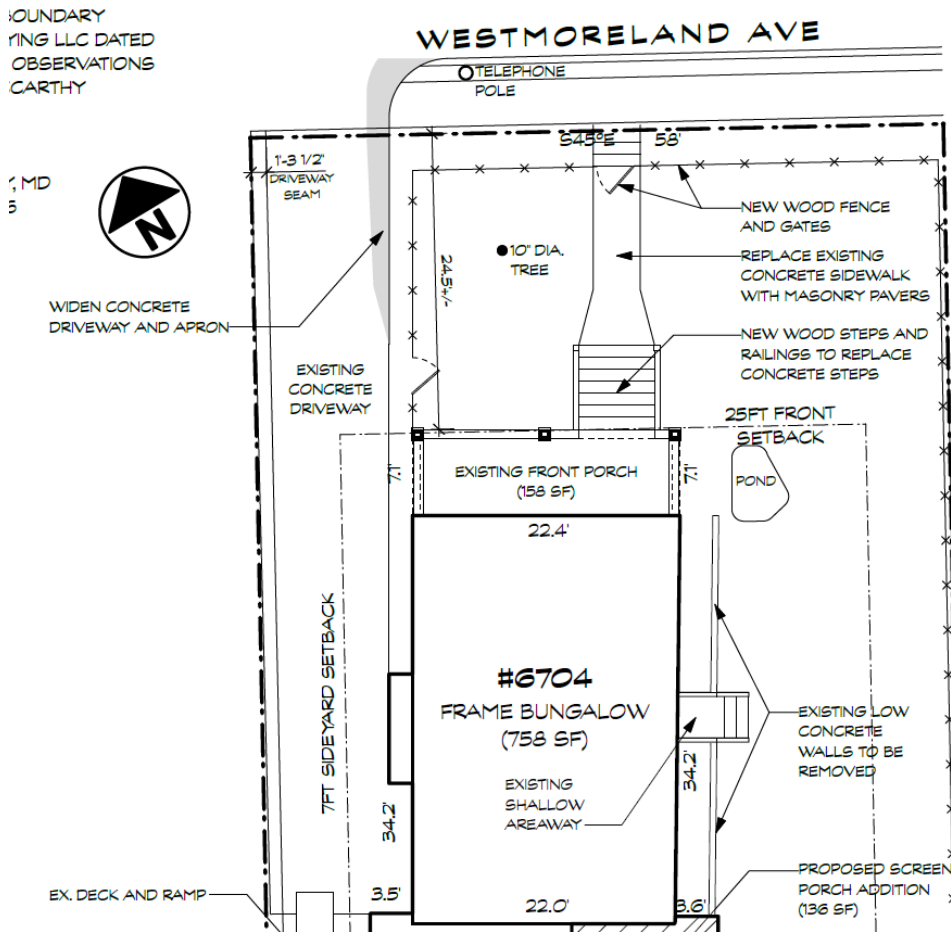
Site plan detail showing the proposed fence location and hardscape alterations.
